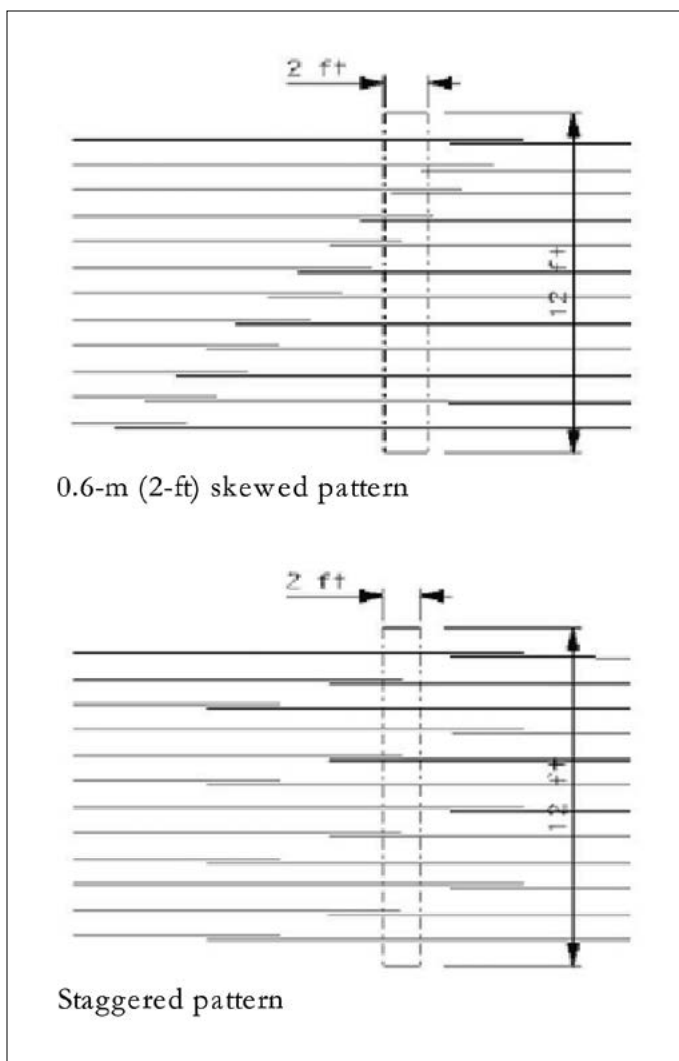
Typical lap-splice patterns (skewed and staggered) for longitudinal steel.
